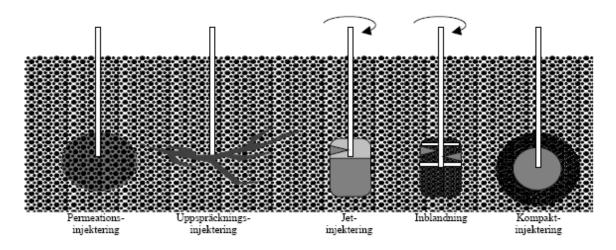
Different types of injection methods. From left to right: Permeation grouting, fracture grouting, jet grouting, mixing and compaction grouting (Hansson 1999).
